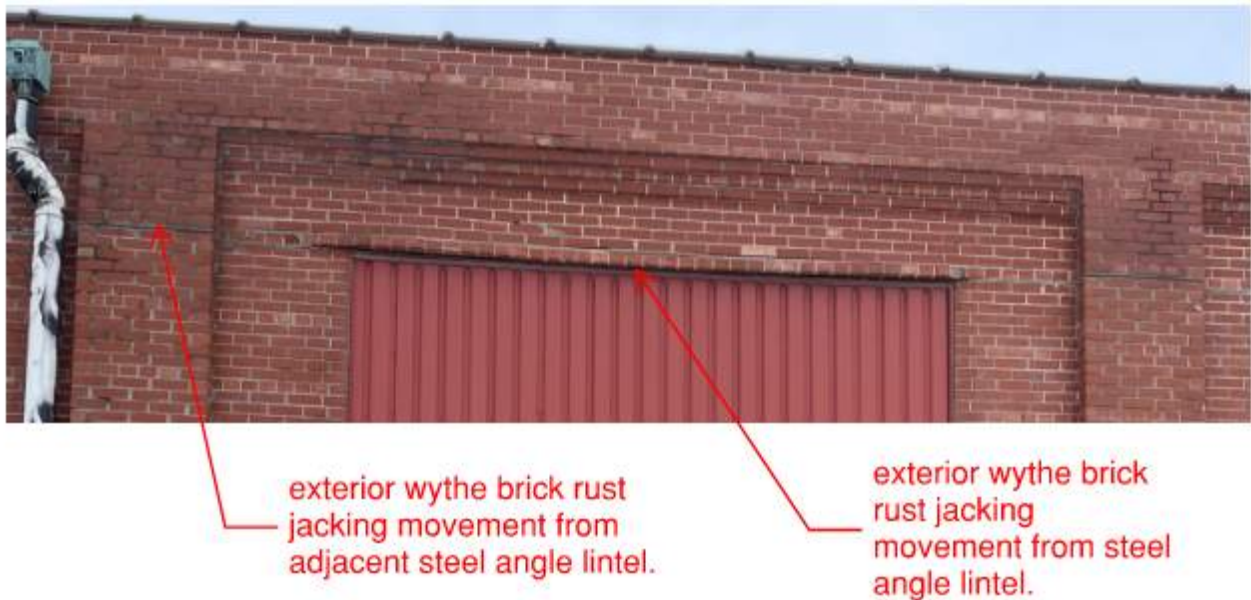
North Building Wall Deterioration Lintel Rust Jacking Example
